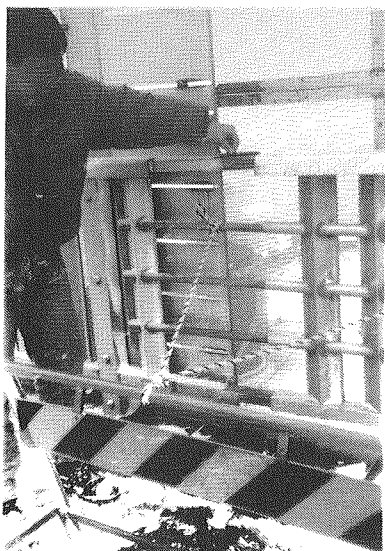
The expanded handrail of the Hachinohe-Ohashi bridge
